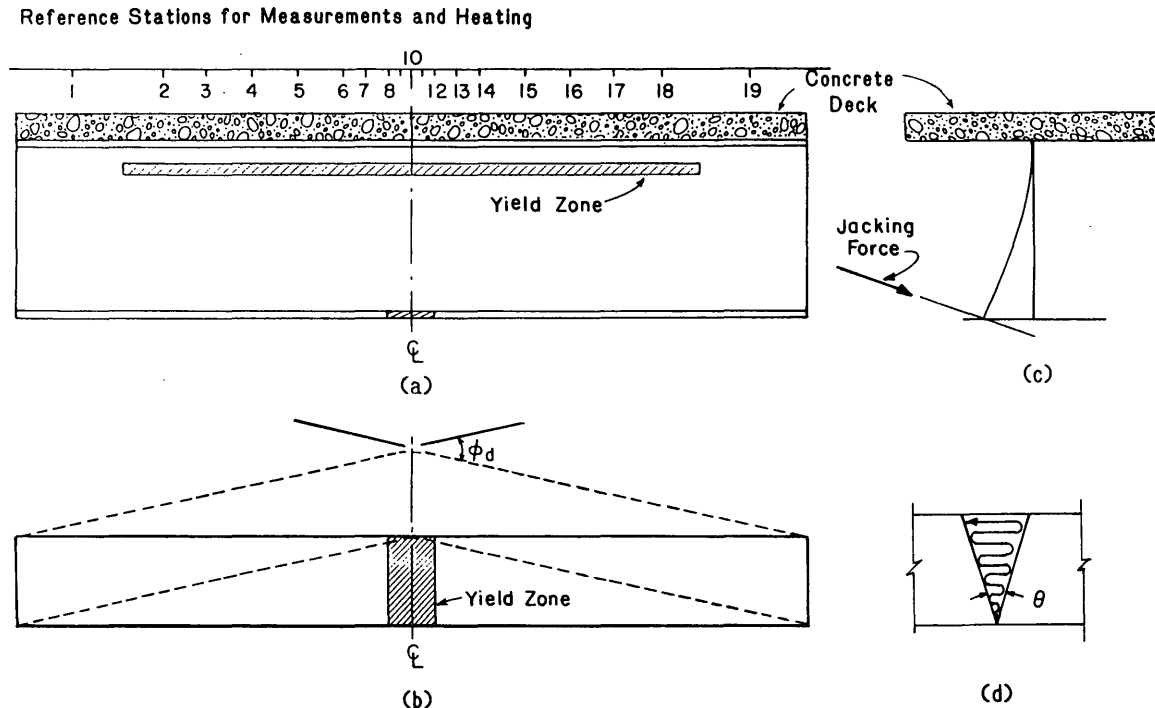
Deformed shape and yield zones in W24 × 76 girder: (a) front view, (b) bottom flange, (c) cross-sectional view, and (d) vee heat.
